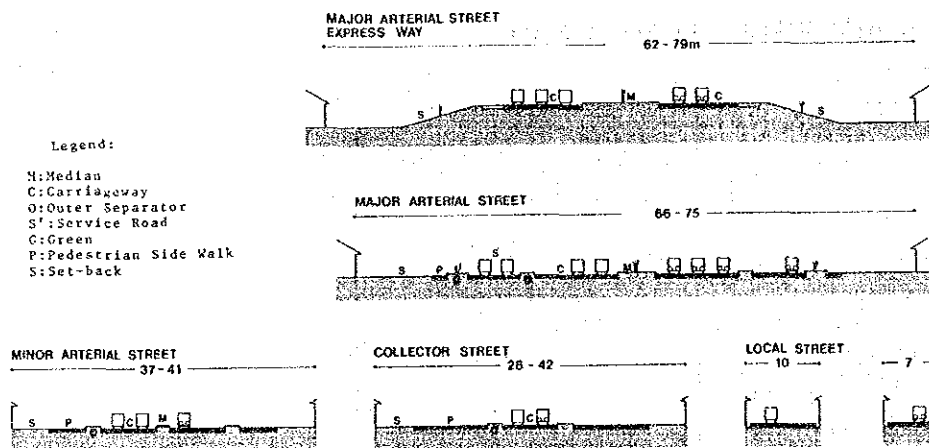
TYPICAL CROSS SECTION OF SECONDARY SYSTEM
